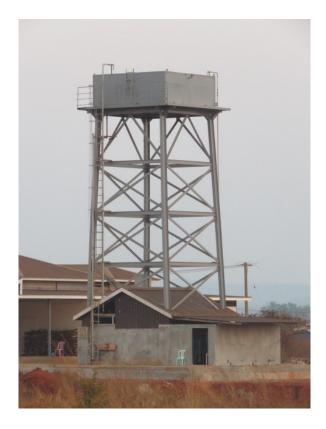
Overhead tank and concrete ground tank (water purification system is inside)
